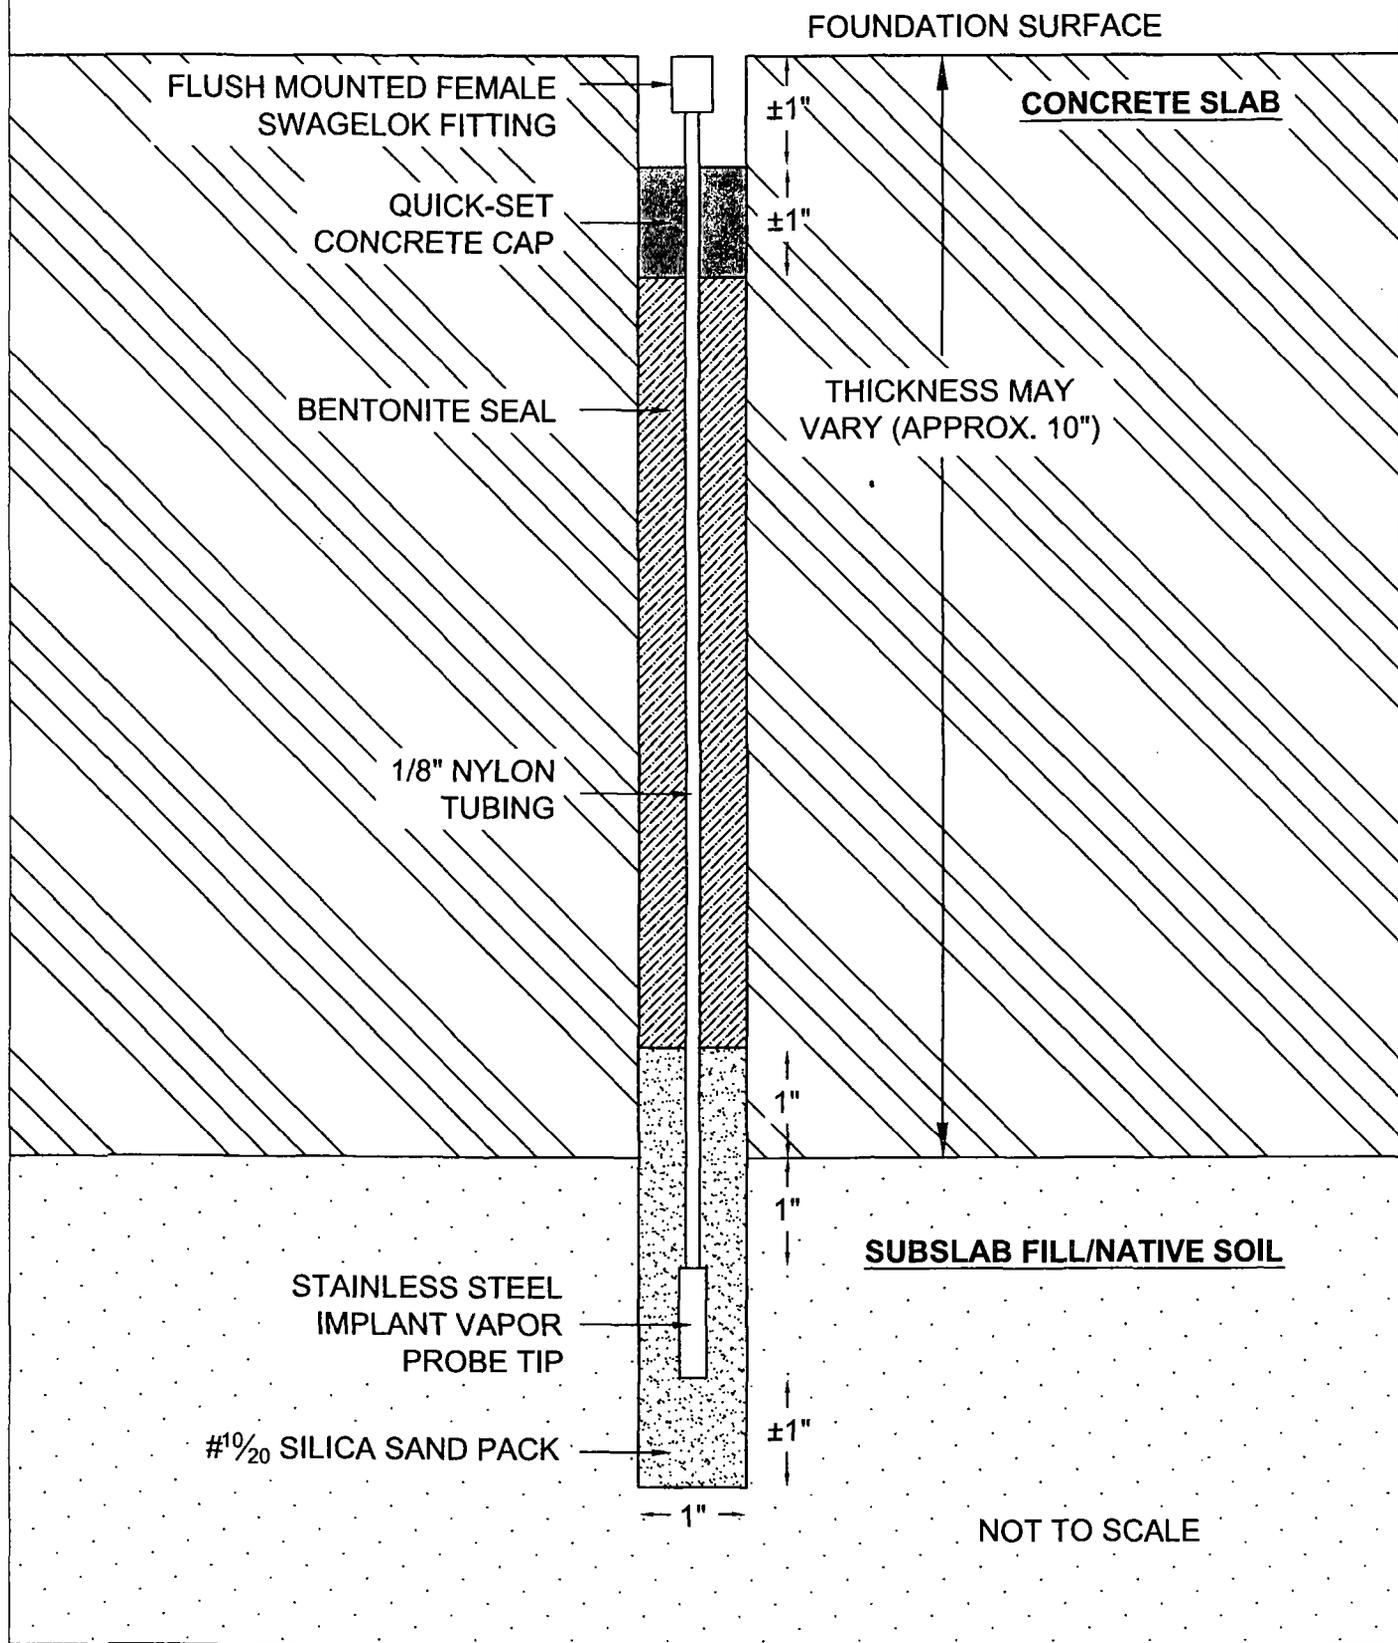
TYPICAL SUBSLAB VAPOR-WELL CONSTRUCTION
